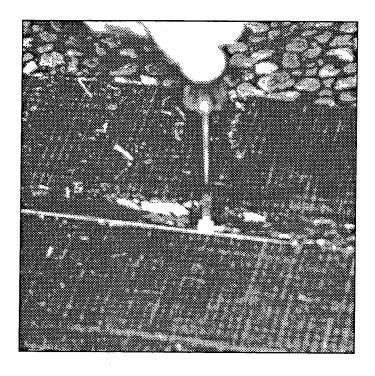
Opening the Plastic Rebar Chairs (photo)
